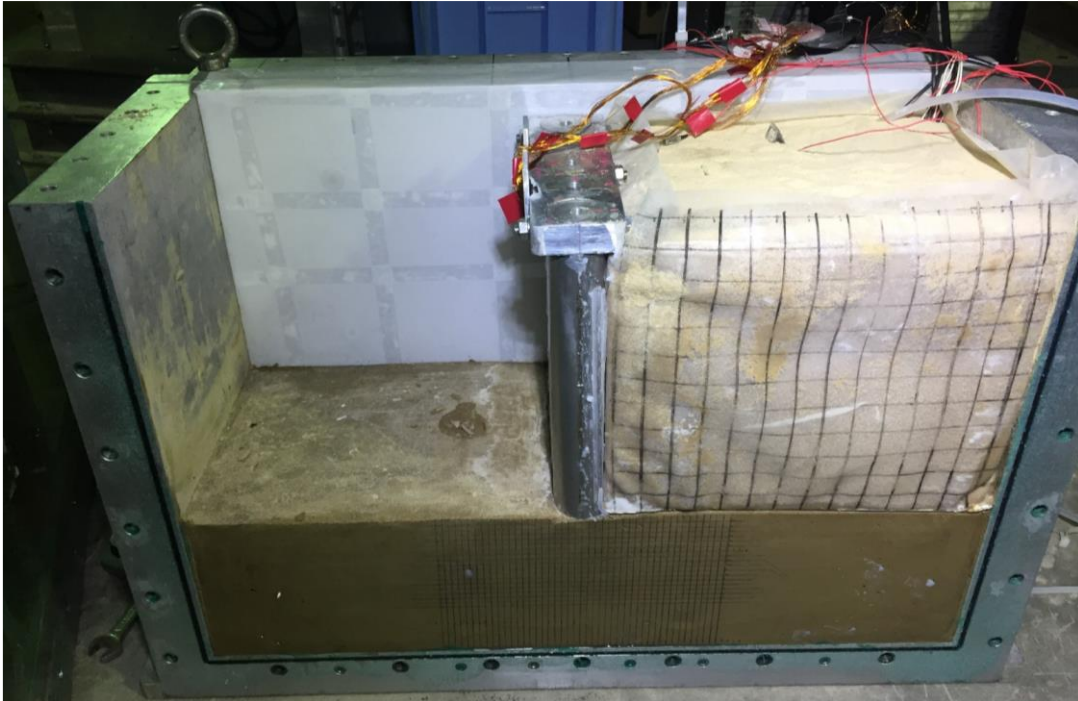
Cantilever steel tubular pile (CSTP) wall embedded in soft rock
